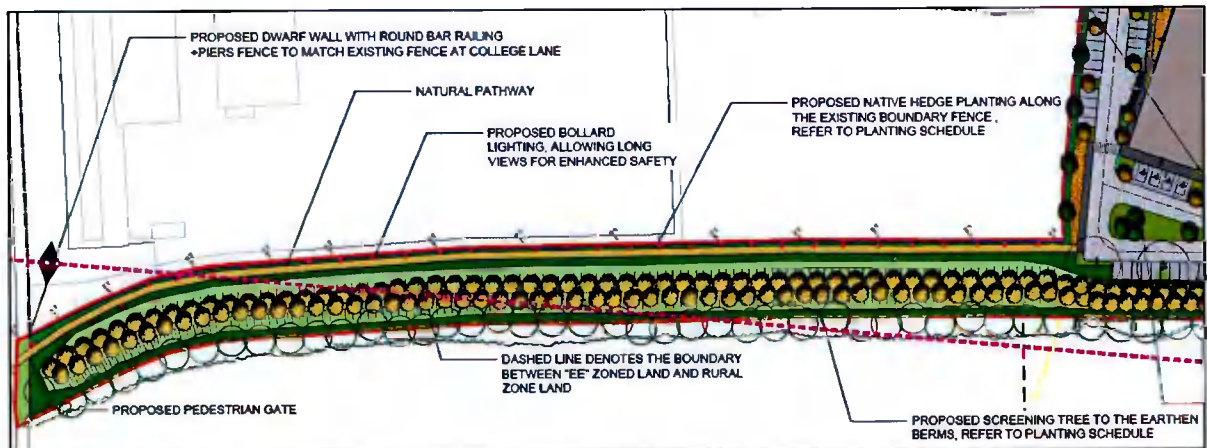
Landscape Masterplan (Drawing No.: FDJ-JBAI-XX-XX-DR-L-0002)
